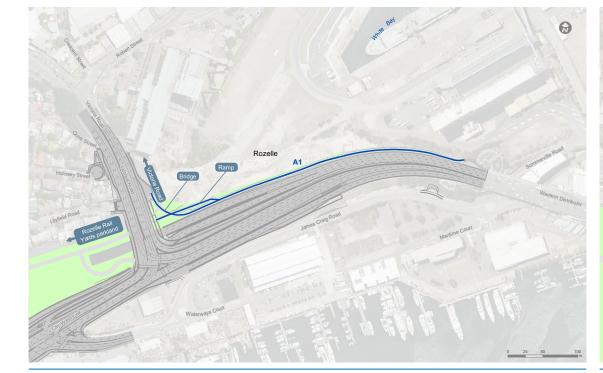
ATN Connections - A1 - Rozelle Rail Yards Link
